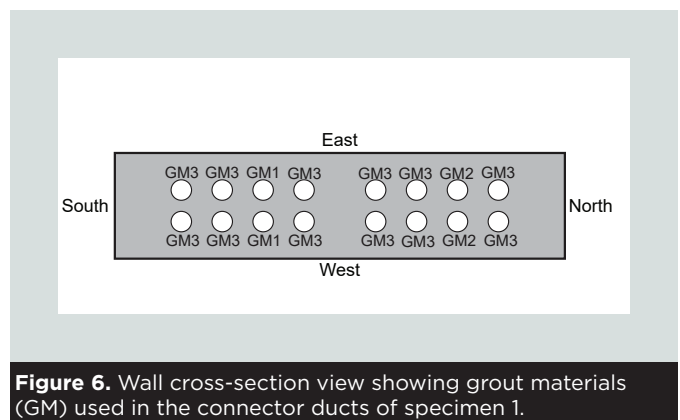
Wall cross-section view showing grout materials (GM) used in the connector ducts of specimen 1.
